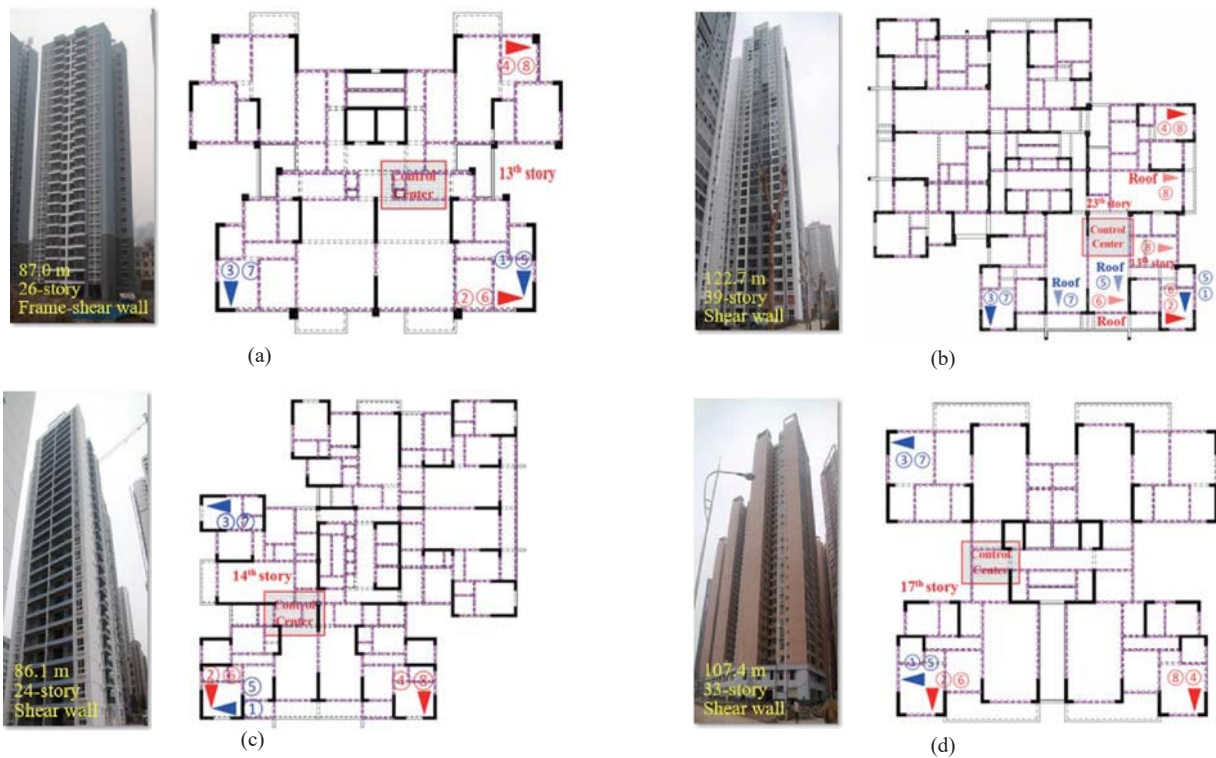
Floor plan of four high-rise buildings: (a) BAYG 2#; (b) JSXQ 3#; (c) XYY A#; (d) SHHM 2# (dotted pink line indicates the infill wall)
